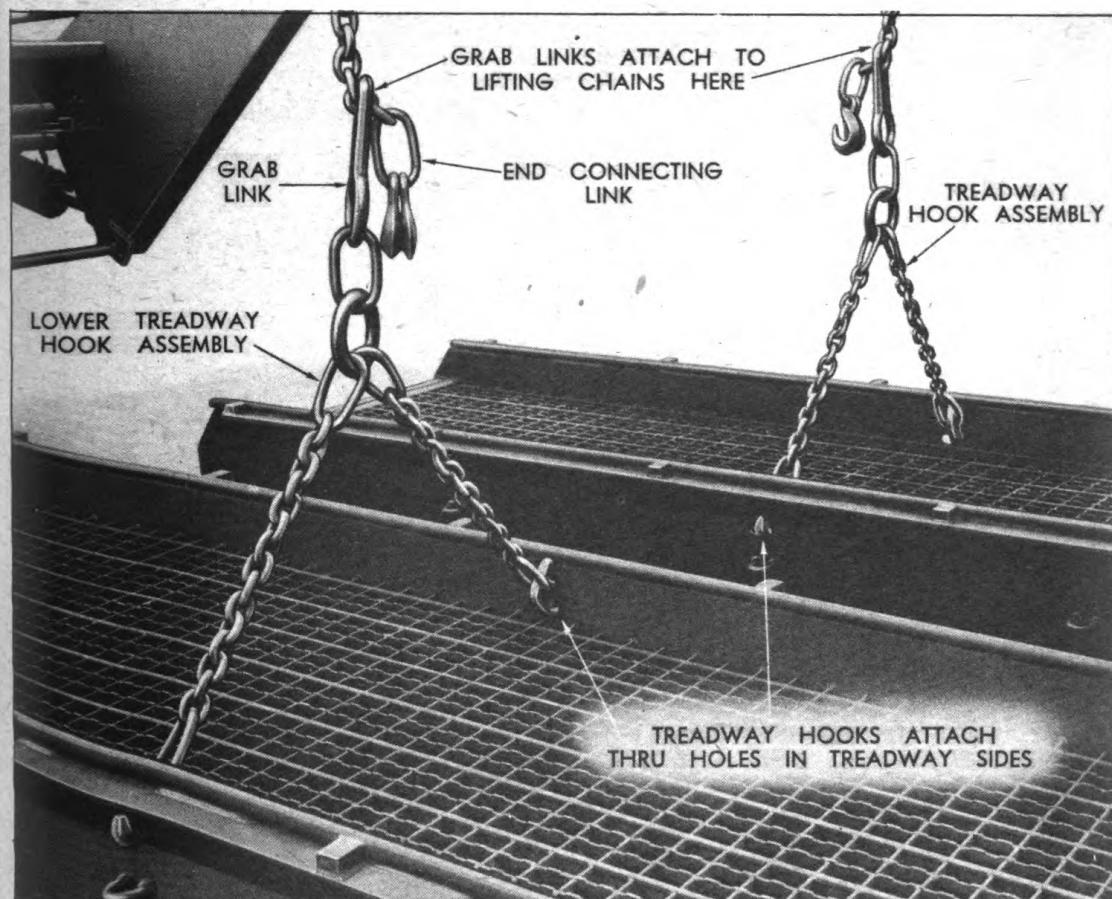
Proper Method of Attaching Lower Treadway Hooks
